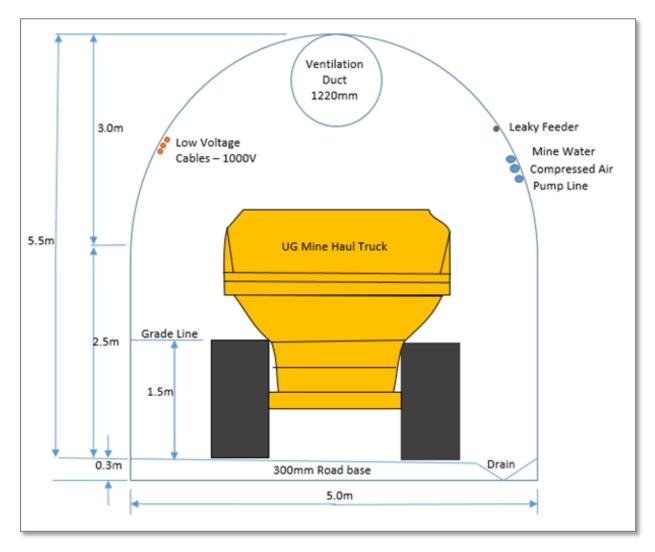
| Typical cross section of the 5.5m x 5.0m arched profile decline showing services and an underground haul truck
